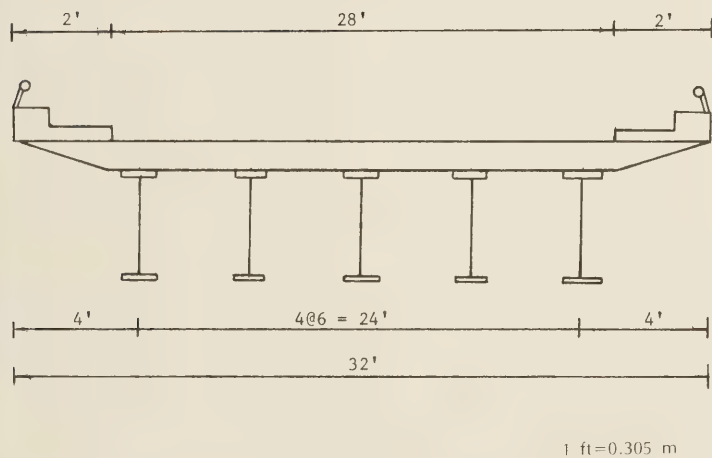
Bridge cross section with 1.8 m (6 ft) stringer spacing.
